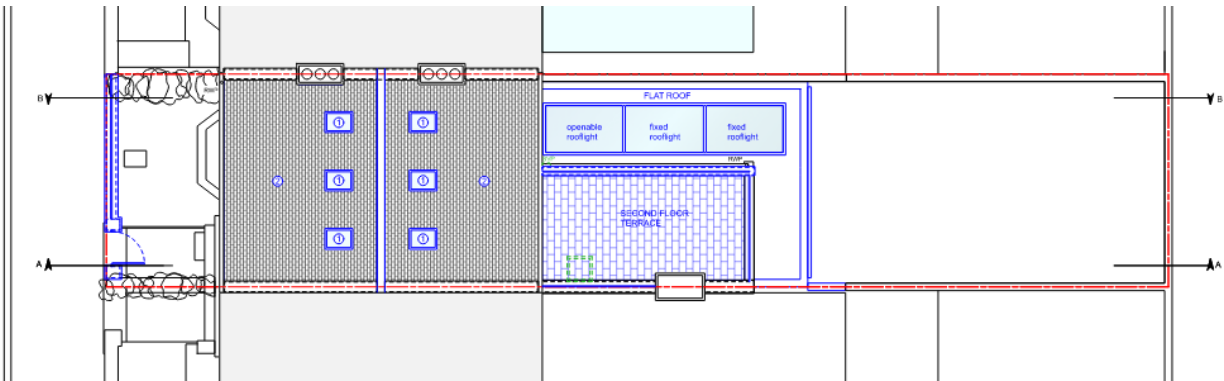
(above): Proposed roof plan (source: Proposed drawings)
